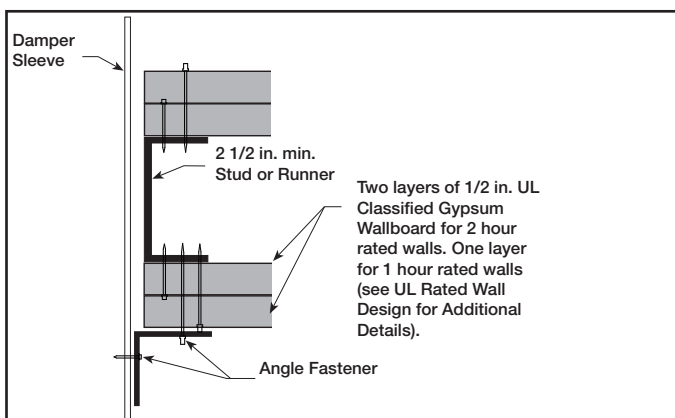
Single Side Angle With Steel Stud Wall - Angle Over Wallboard
